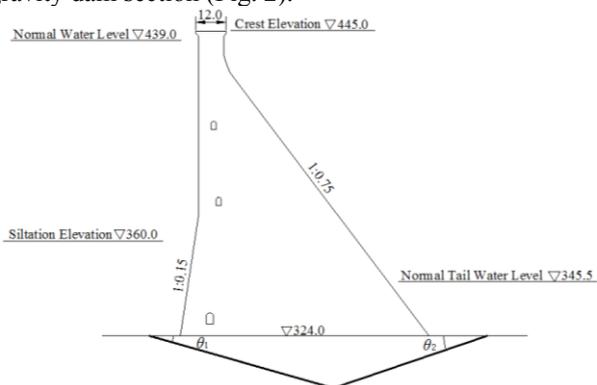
Sketch of stability against sliding of deep foundations (Unit: m)
